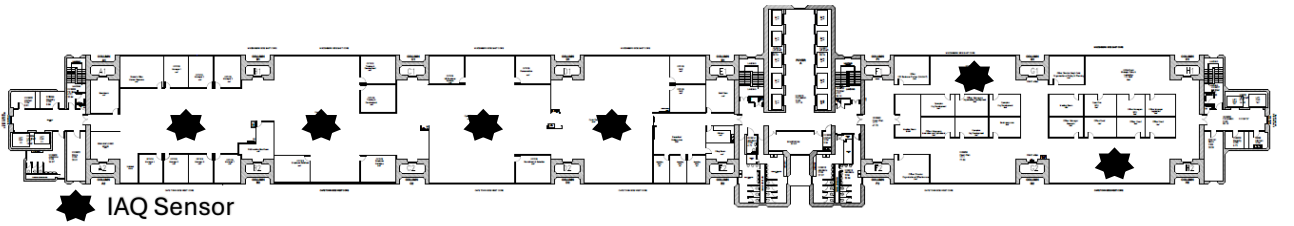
Tower Building proposed sensor positioning 5th floor (6)
